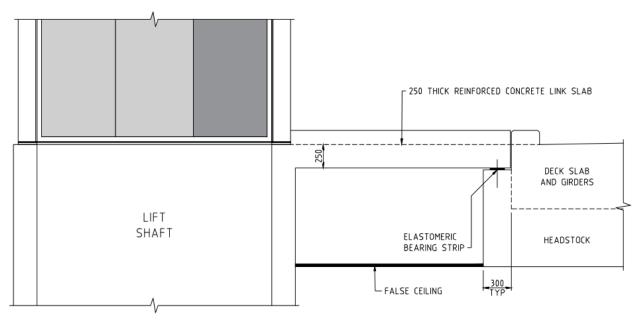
Reinforced concrete link slab detail between lift shaft and bridge pier
